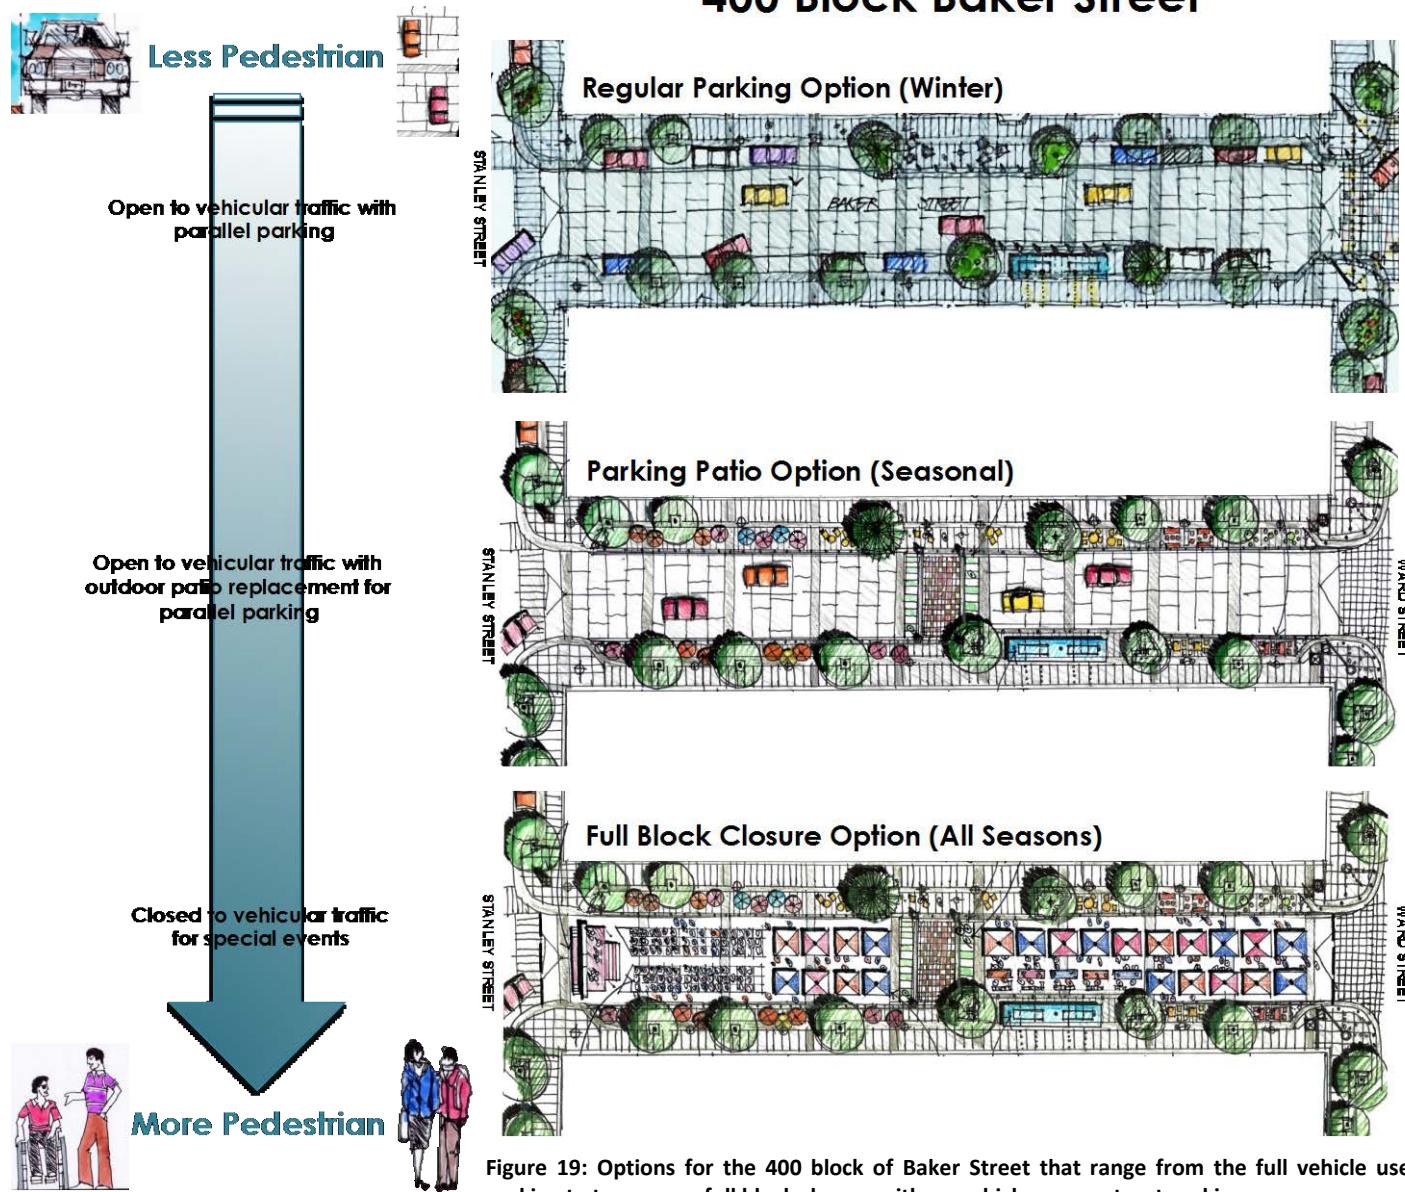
Options for the 400 block of Baker Street that range from the full vehicle use and on-street parking to temporary full block closure with no vehicles or on-street parking
